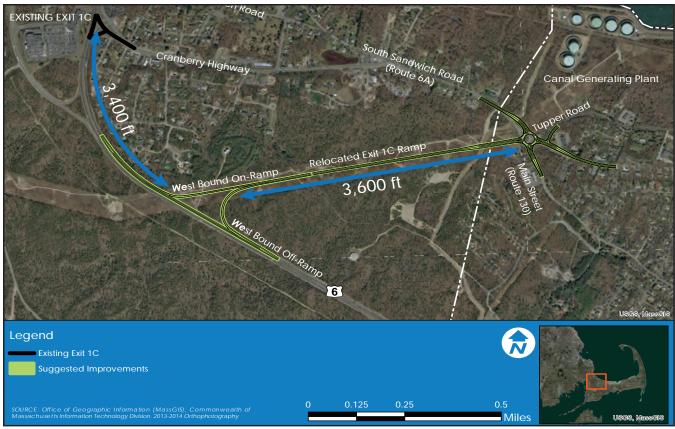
Route 6 Exit 1C Relocation Exhibit 4-14 Route 6 Exit 1C Ramp
